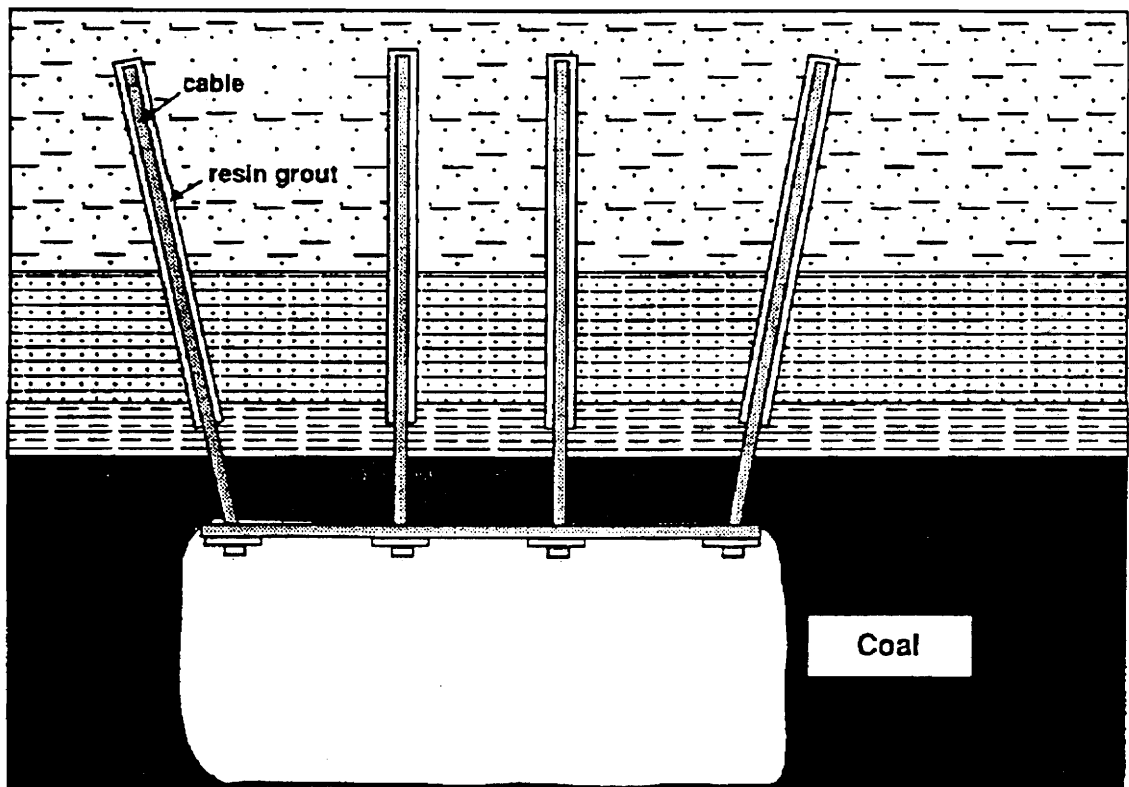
Typical layout of an installed cable bolt secondary support system (after McDonnell, Tadolini, and DiGrado, 1995).
